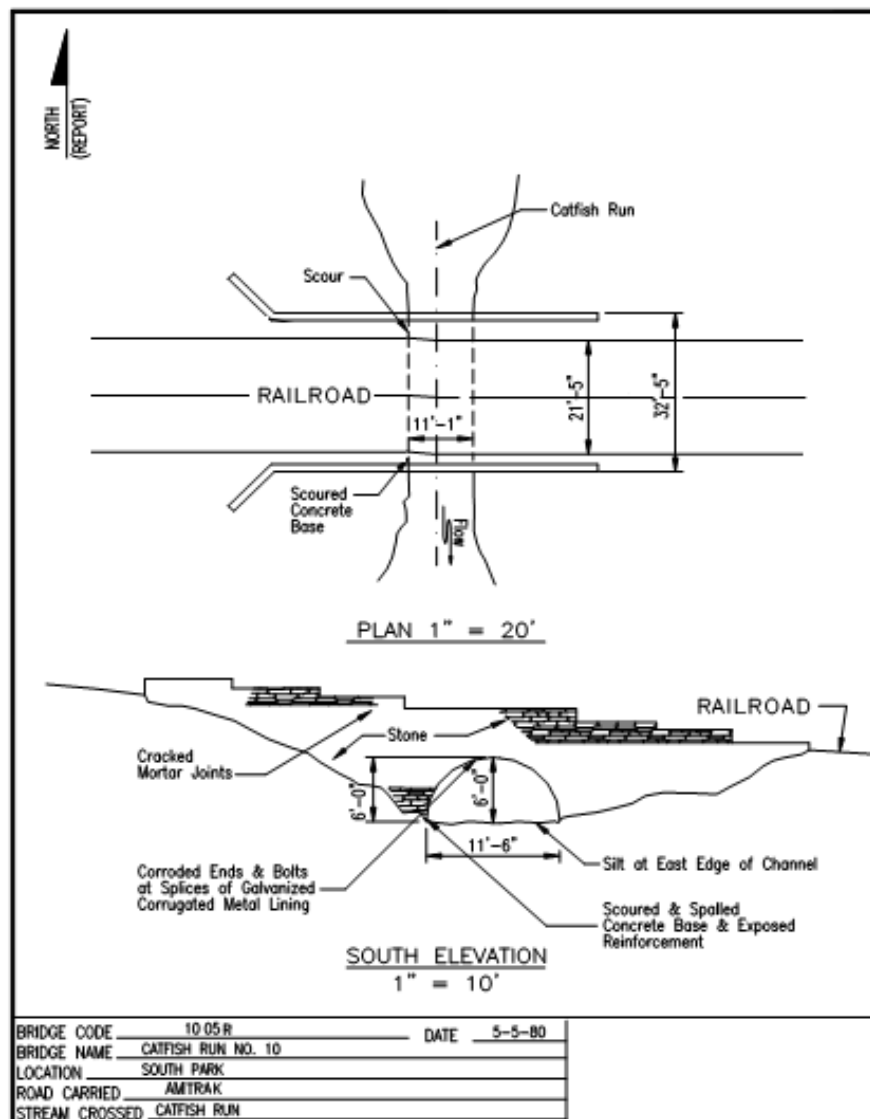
Example Field Note: Inspection Site Layout
